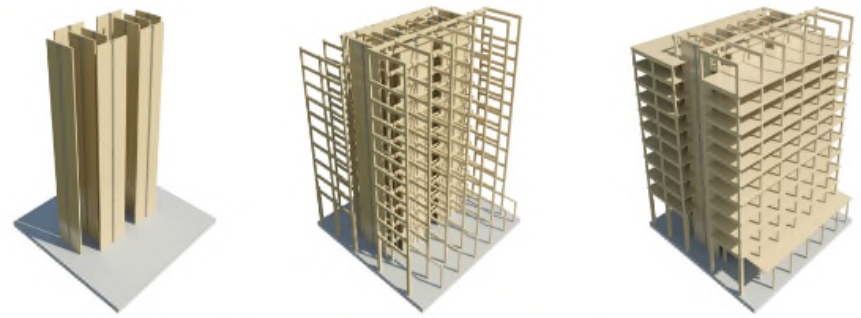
Mass wood primary structural frame for Framework, Portland, Oregon (image: Lever Architecture)
